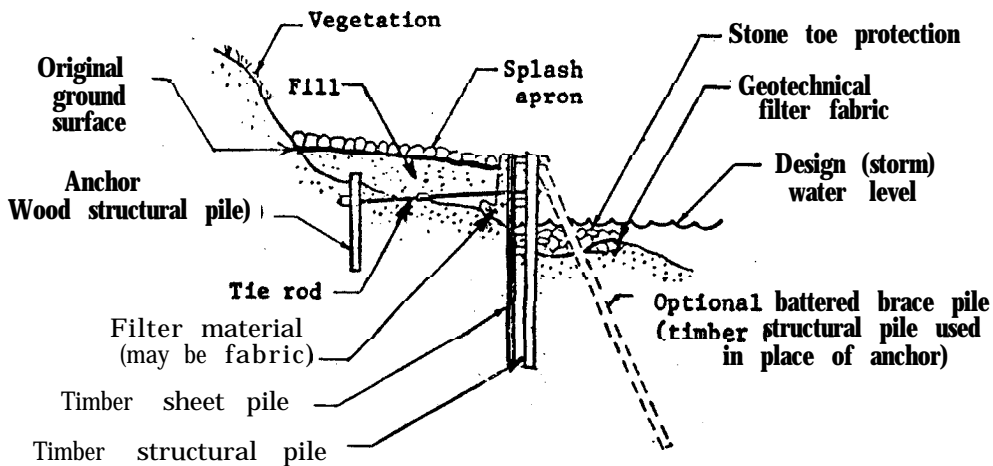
Anchored or Braced Wood Sheet-Pile Bulkhead
